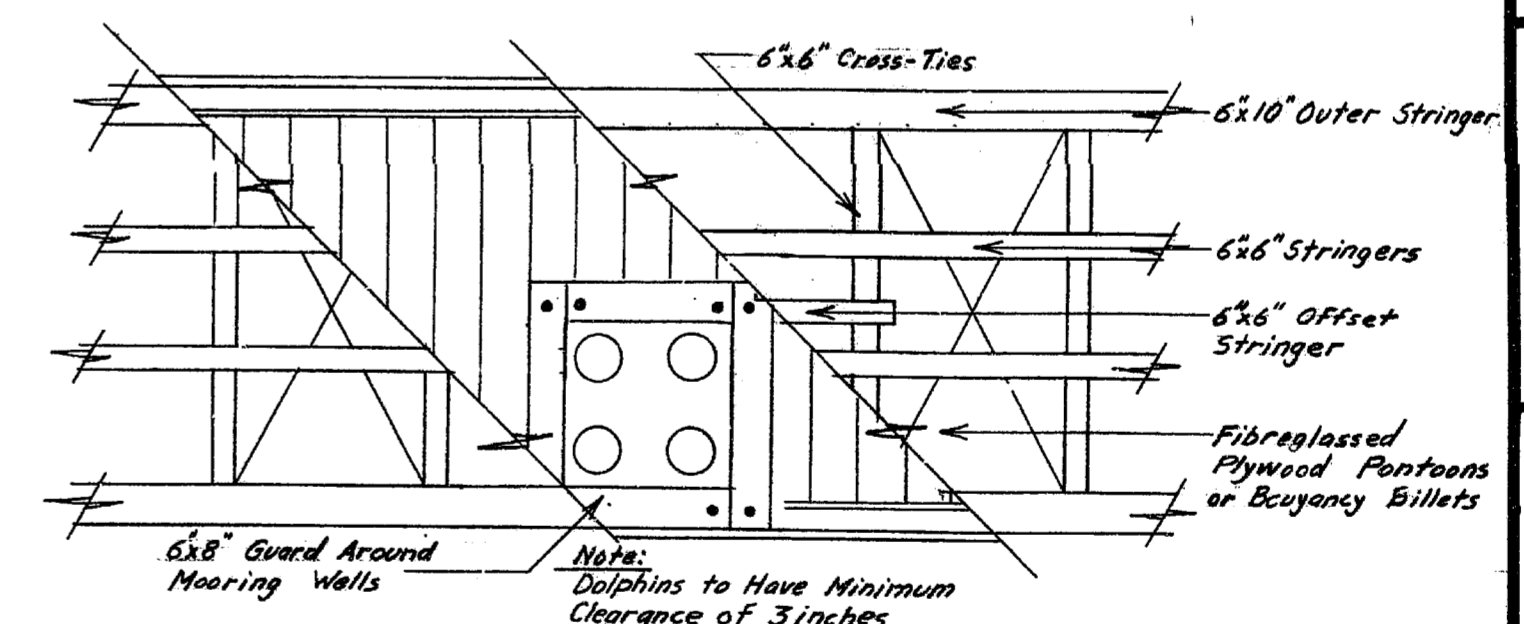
TYPICAL 4-PILE DOLPHIN DETAIL Scale: 1/4"=1'-0"
